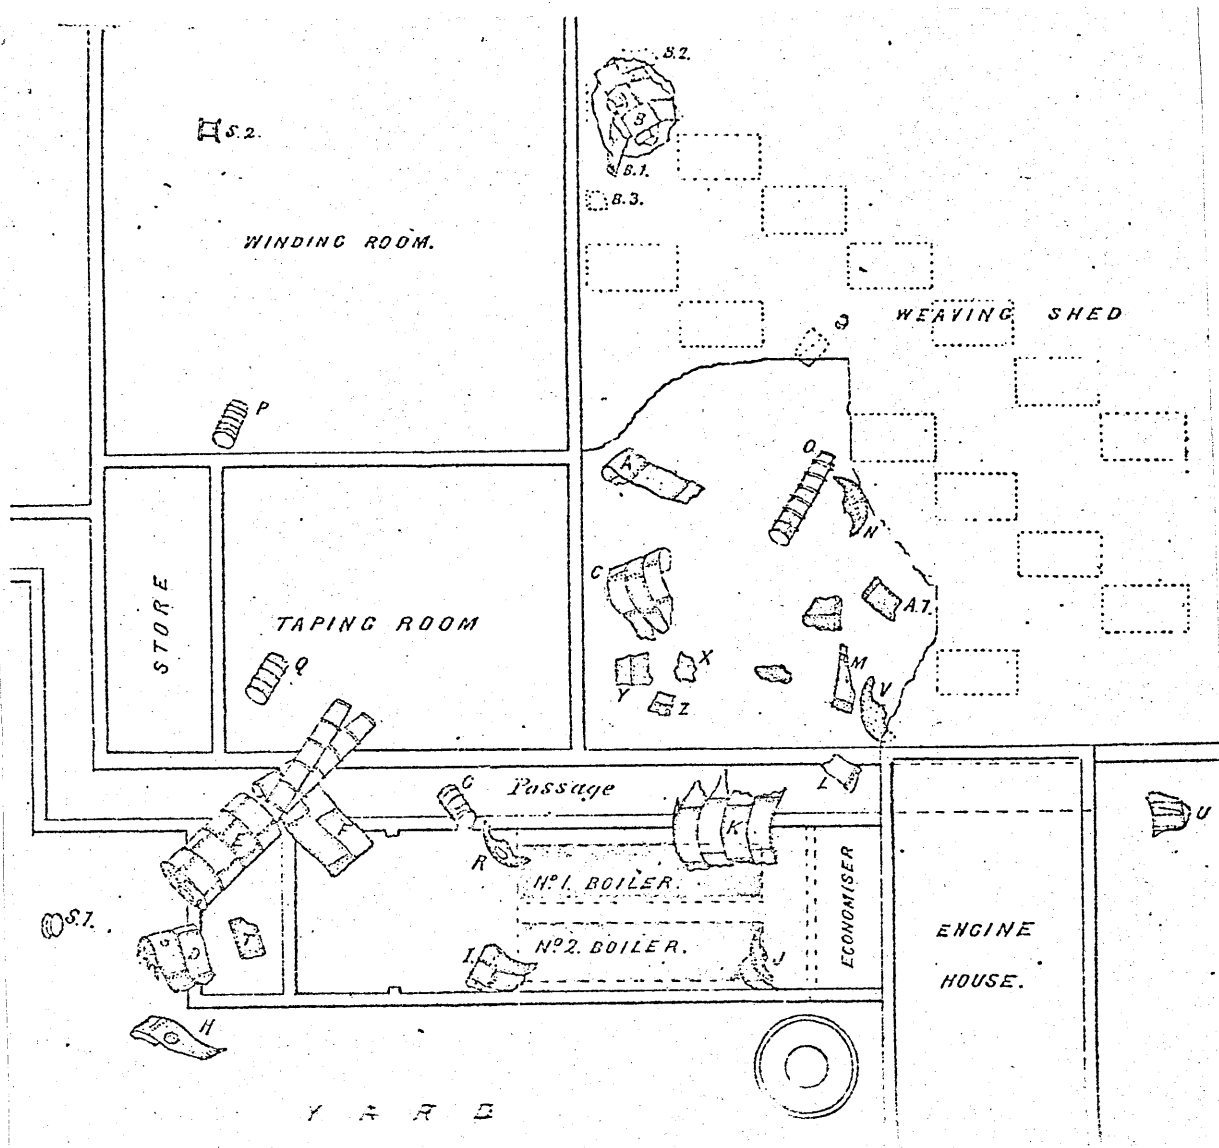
LOCATION OF FRAGMENTS FOLLOWING THE 1874 BOILER EXPLOSION AT BLACKBURN.
